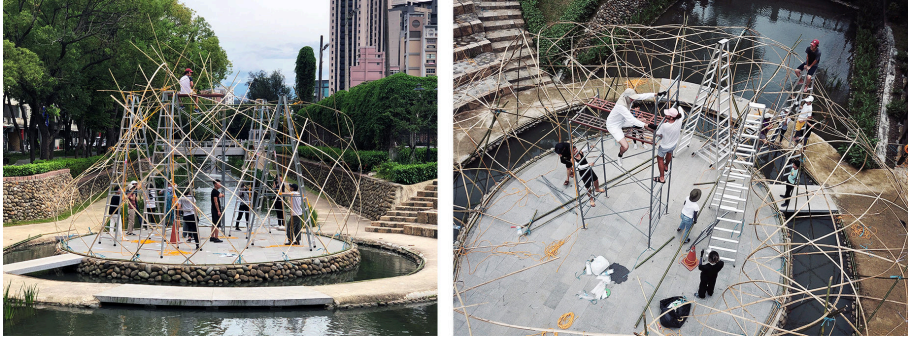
Under construction: central column installation (left), connection of top grid (right).
